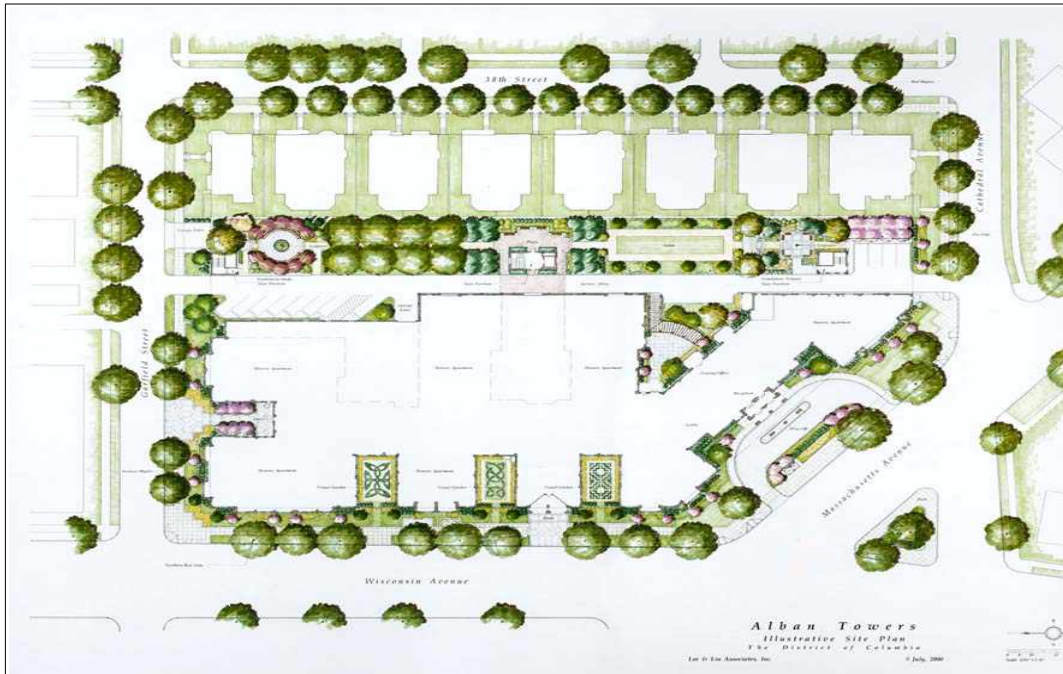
Illustrative Site Plan, Alban Towers Garage Rooftop Garden
